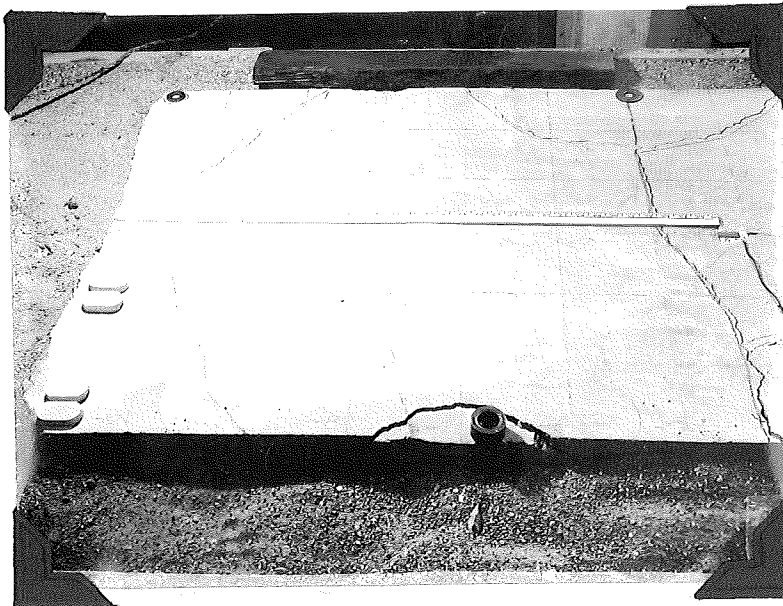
Corner break from axle loading in left foreground, edge failure due to load on semi-circular plate in center foreground, corner break caused by single wheel load in left background, and failure from edge load on 1-3/4 in. disc at right.
